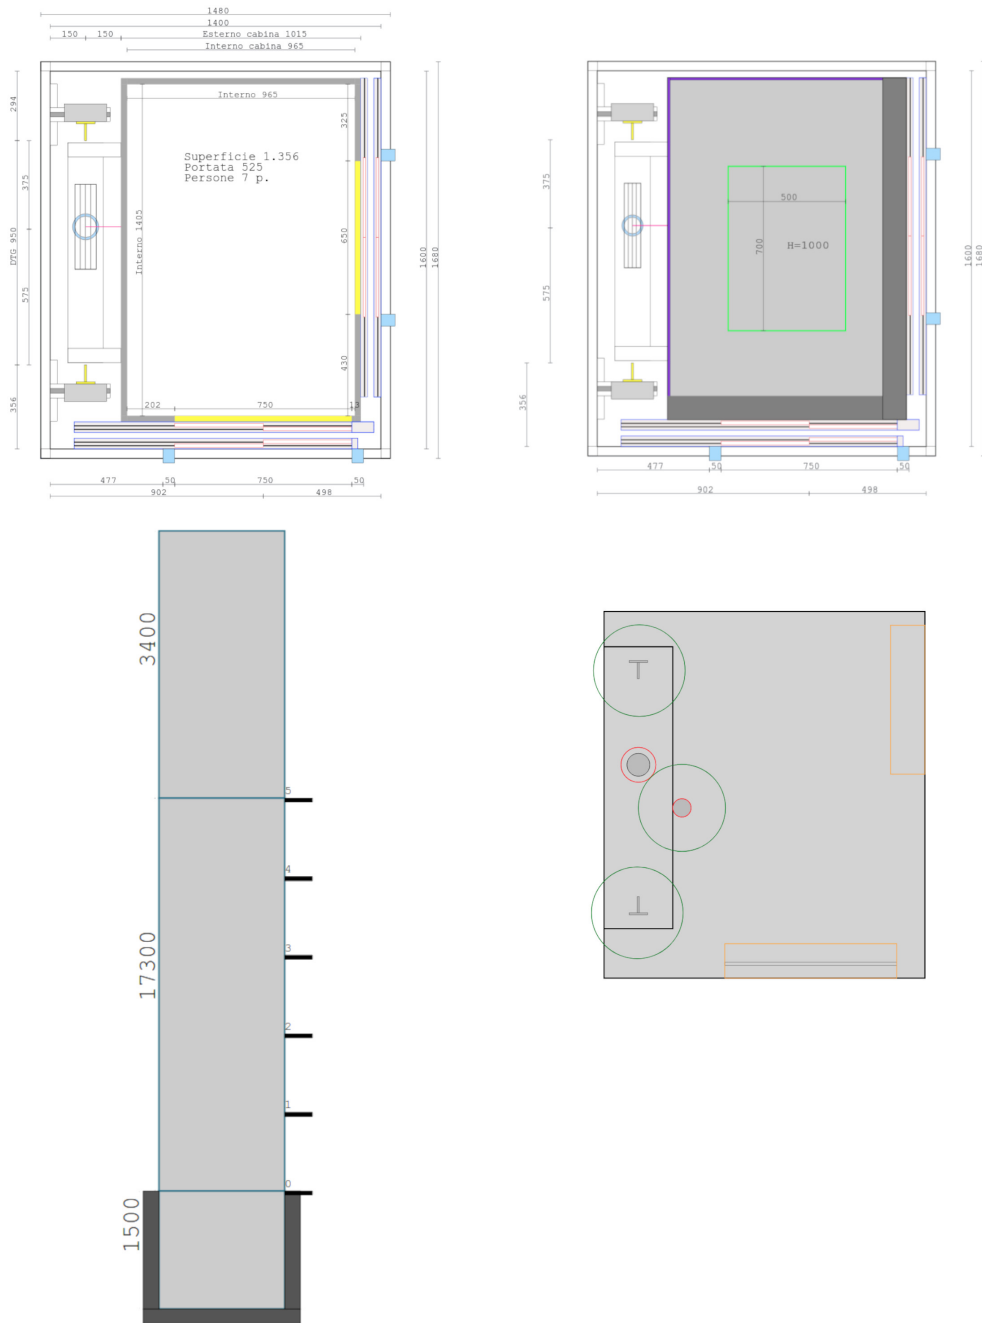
Technical drawing reporting the 2D cad drawing of a RHE - Roped Hydraulic Elevator
